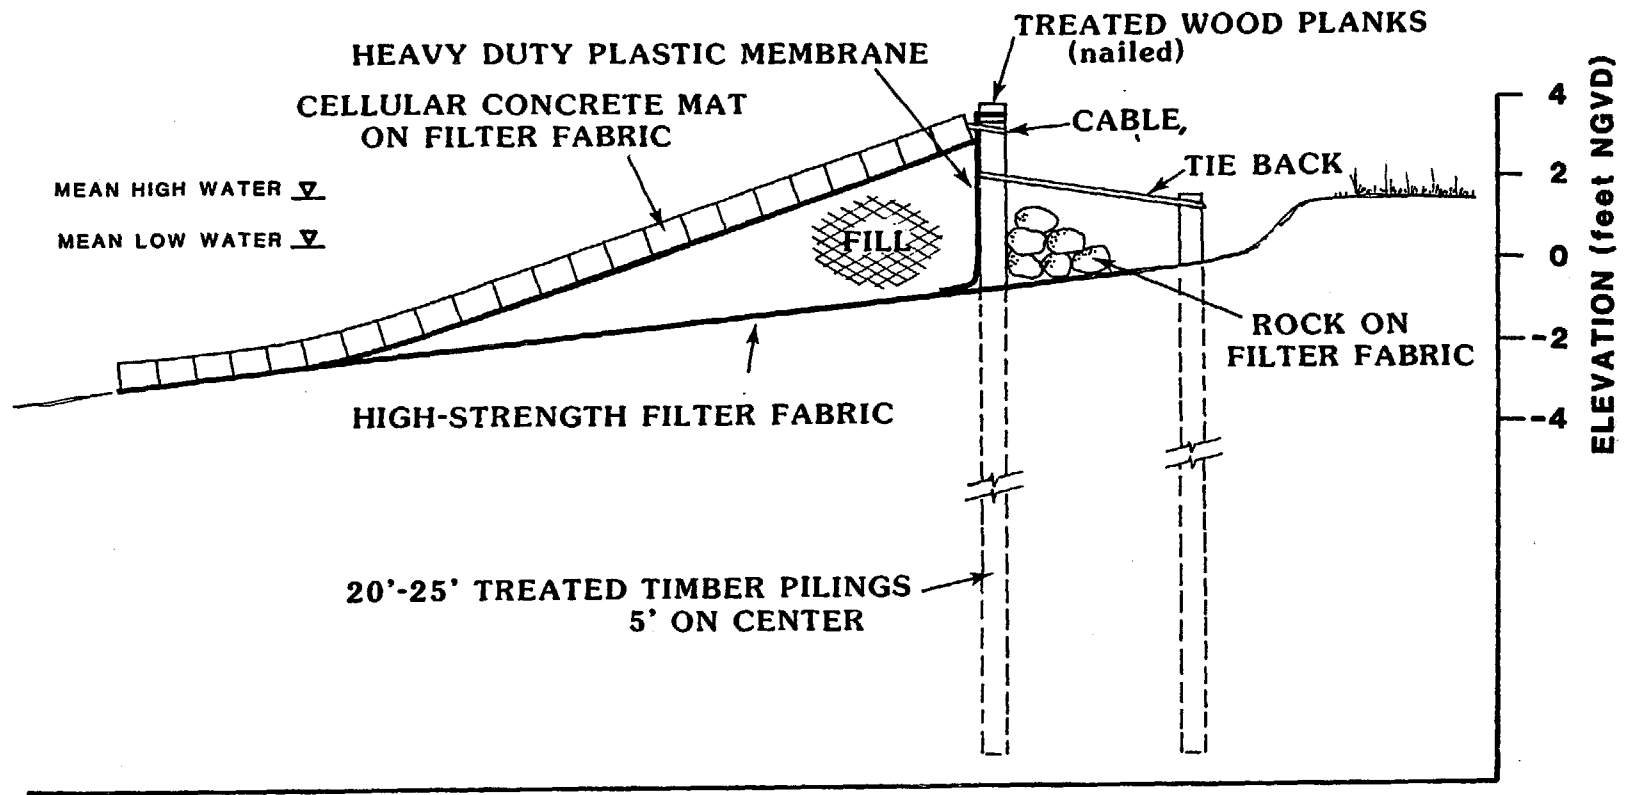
Cross-sectional design of suggested shoreline protection Measure 2: armored spoil bank.
